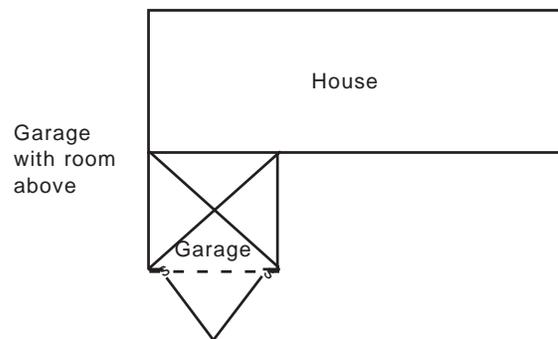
Additional bracing. Home configuration where there is no in-line wall. Additional bracing may be appropriate in this situation.
